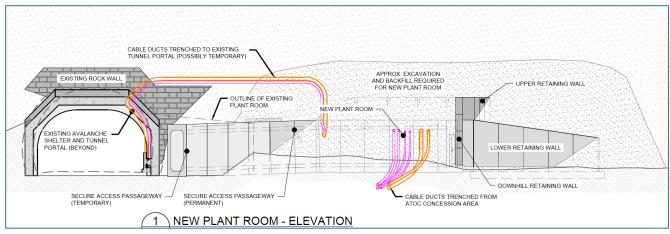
elevation of proposed new equipment building at "East Homer" Concession area PAC-14-18-40.
